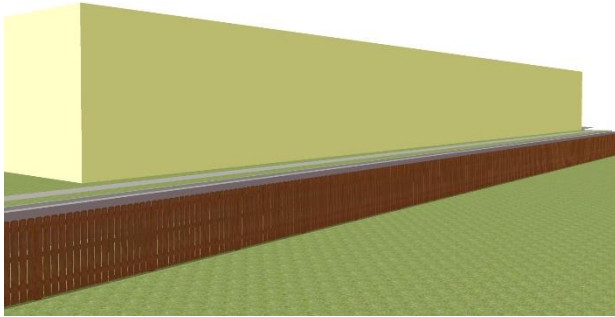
Inappropriate example of a long unbroken wall plane adjacent to a residential area.
